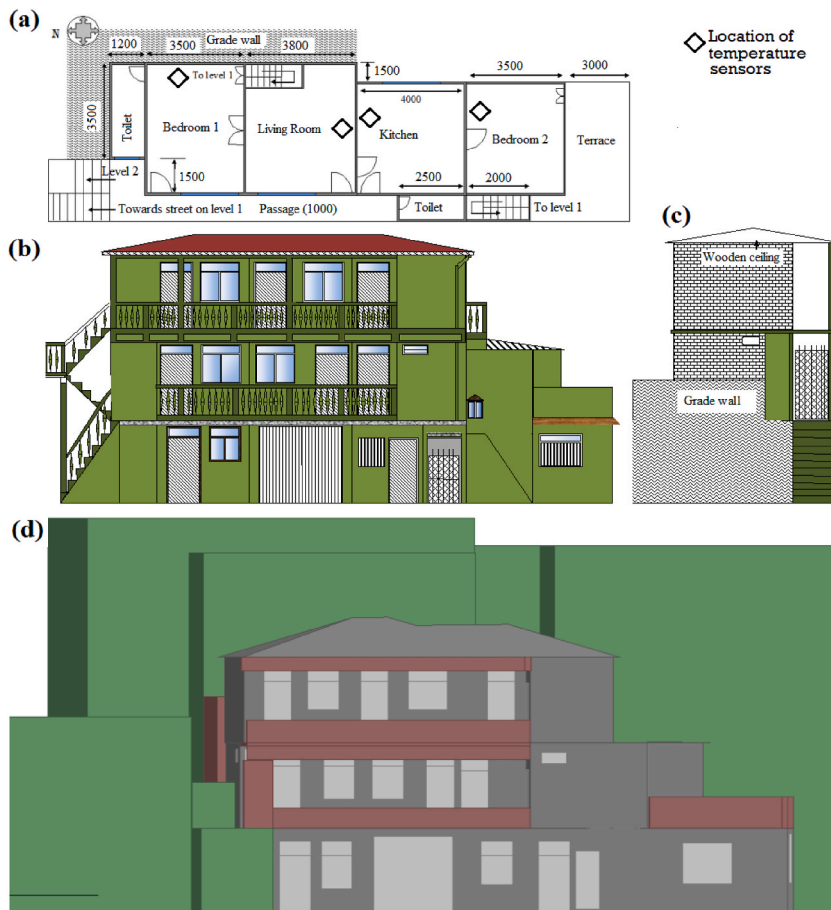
(a) Floor plan of the first floor of the modeled building (note: the east and north wall is below grade till the middle); (b) west section (front face) of the building; (c) north face of the building showing the grade wall; and (d) model of the building in DesignBuilder. The green background in (d) represents the hill slope on the eastern side (back) of the building (Ref: Thapa [55]). (For interpretation of the references to color in this figure legend, the reader is referred to the Web version of this article.)
